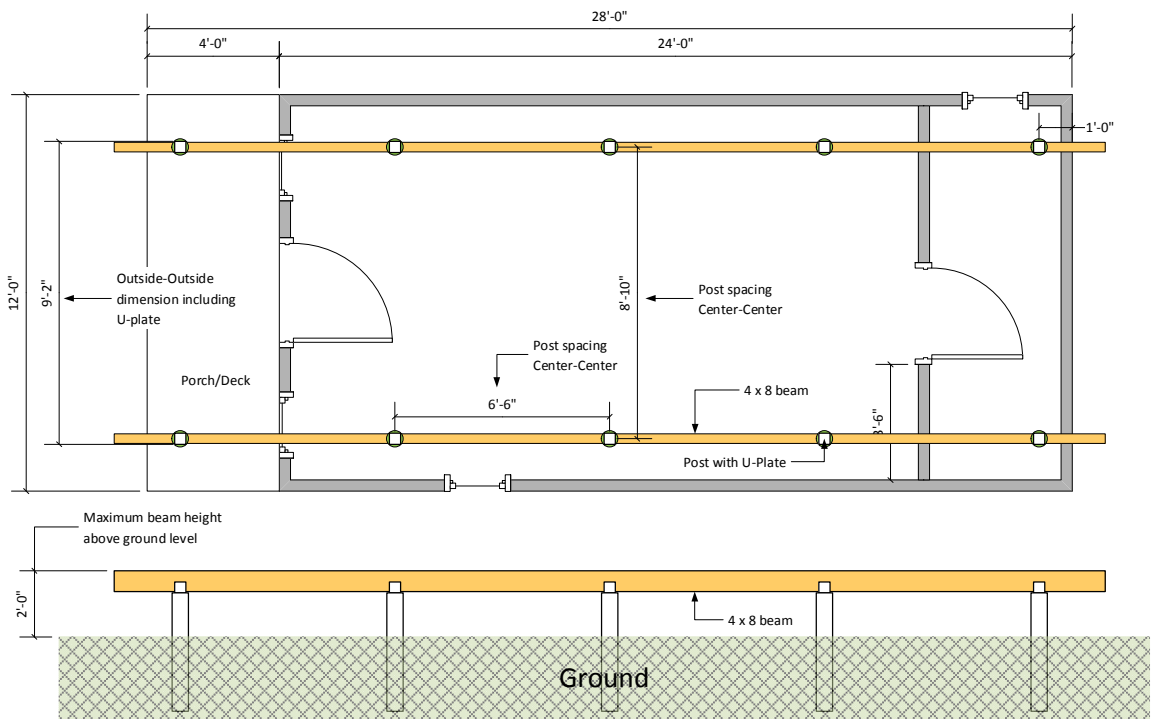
~ Plan view of the foundation showing the post and beam structure and building walls. Additional strength is provided by beams in the building floor structure (not shown). (Image © 2014 W. Reeve)
